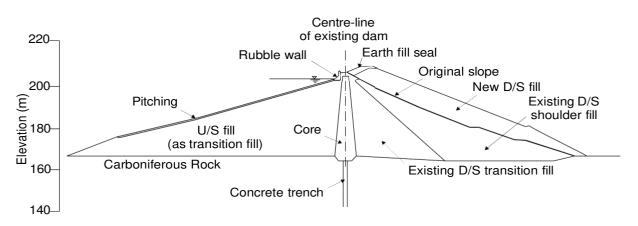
Typical cross-section of original and reconstructed Ladybower Dam.
